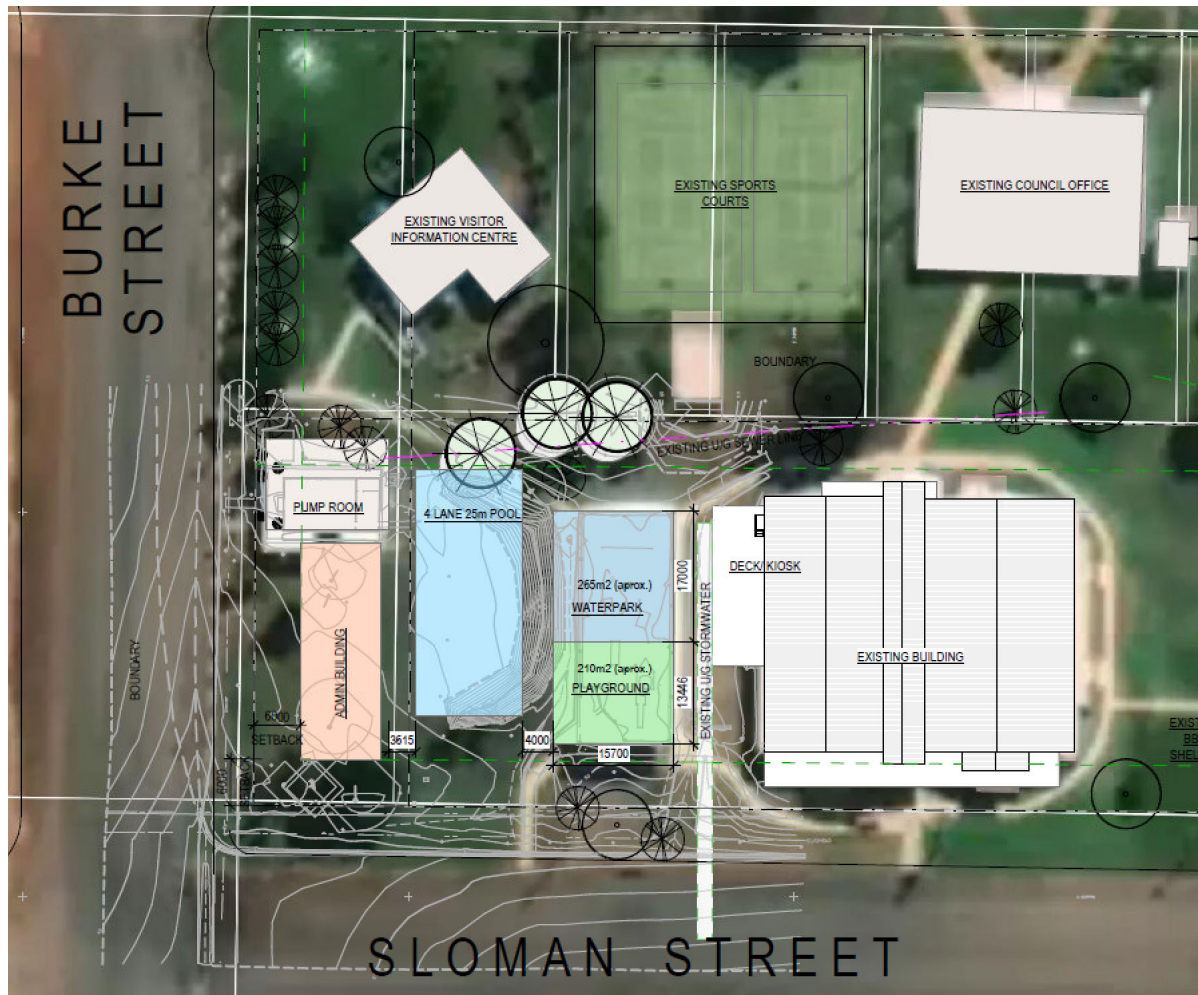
Burketown Health and Wellbeing Precinct – Master plan as laid over the existing aerial photo
